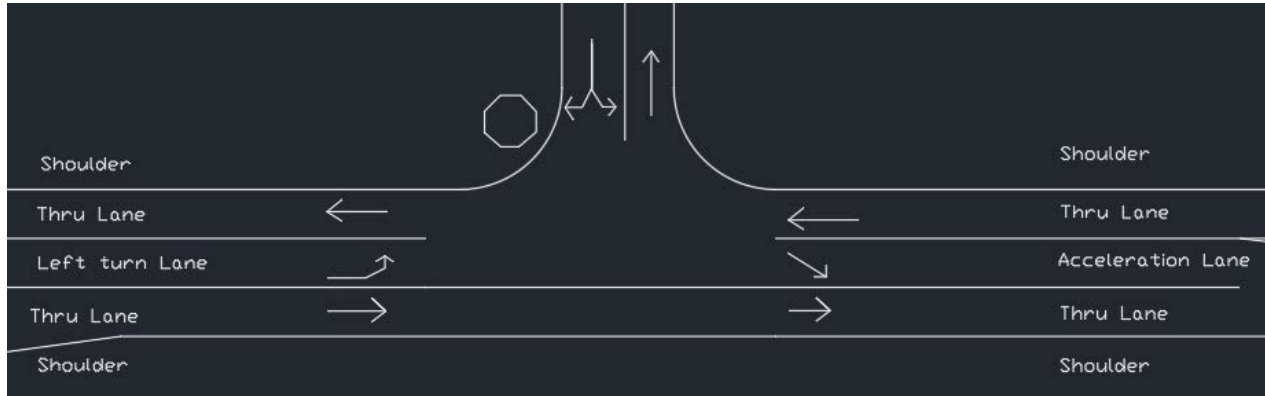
Conceptual Layout of Caltrans' Proposed Restriping Project (not to scale)
